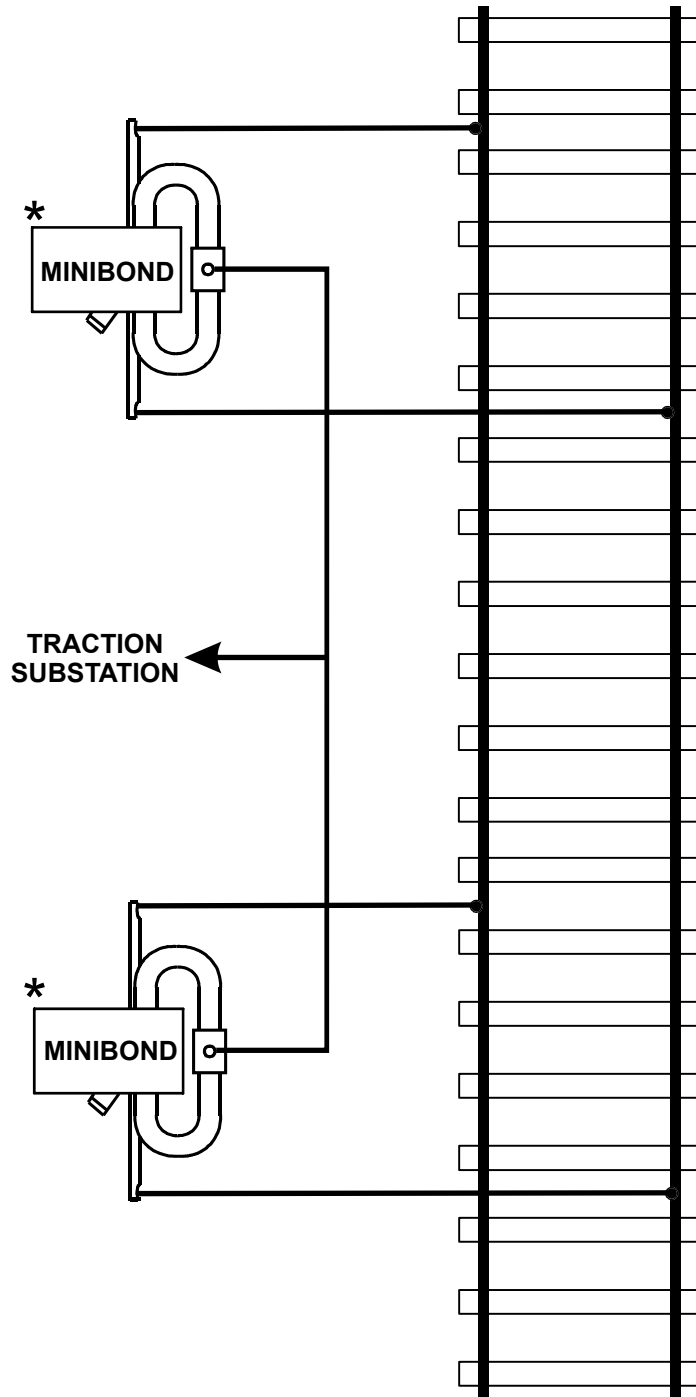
Typical Minibond Application (Mounted Inside Rails)
